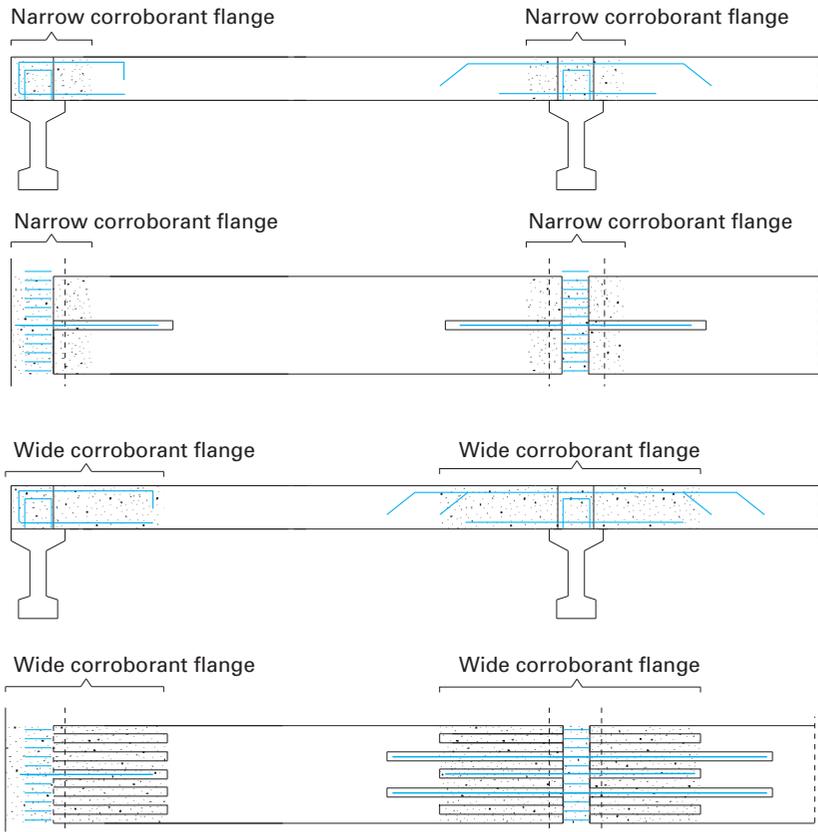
Precast I beams with hollow core floor in continuity and some corroborant flanges:
